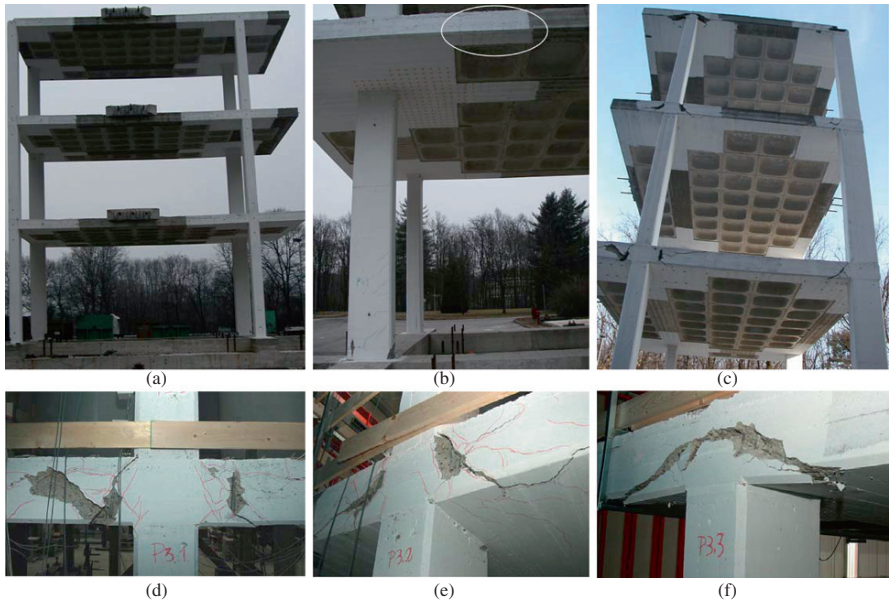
Flat slab frame after pseudodynamic test at the ELSA laboratory of the JRC: (a) side parallel to loading; (b) hinge in slab in positive (sagging) bending and plastic hinges at column base; (c) side at right angles to loading, with slab damage around connections; (d) edge slab-column connection, 1st floor; (e) edge slab-column connection, 2nd floor; (f) edge slab-column connection, 3rd floor (pictures (d)–(f) courtesy F. Taucer, JRC). (See also Figure 2.17 on page 107)
